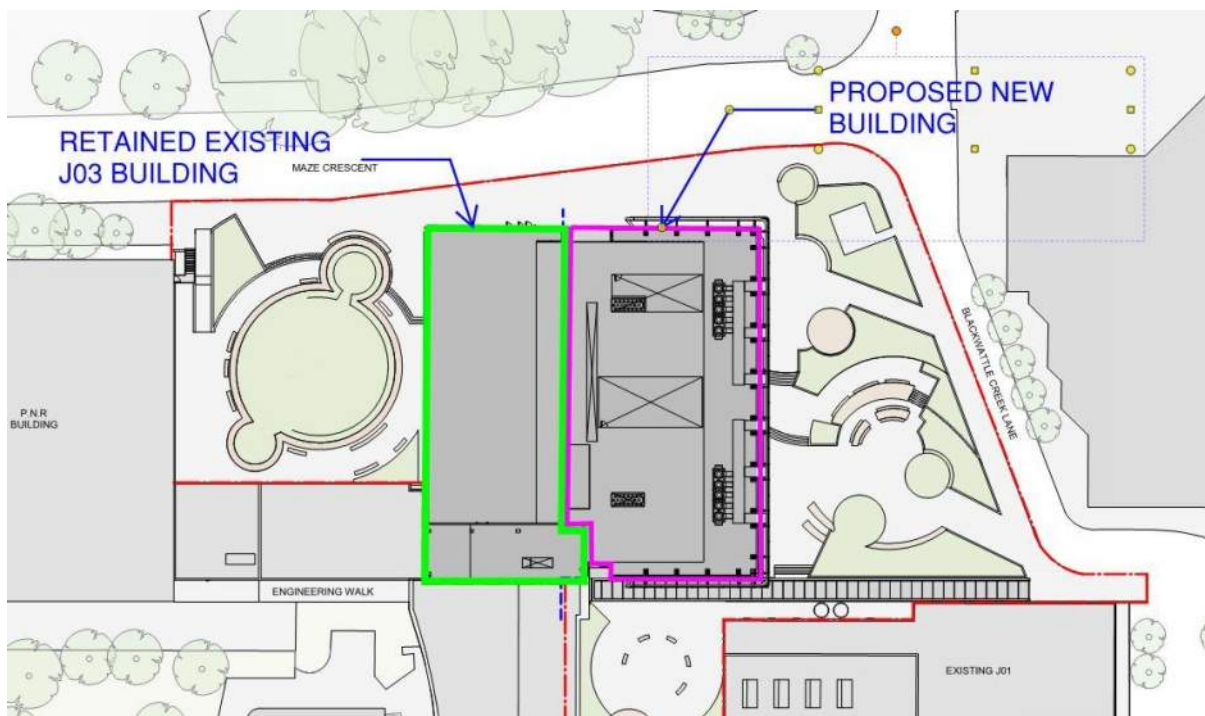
Proposed Redevelopment of Existing Electrical Engineering Building
